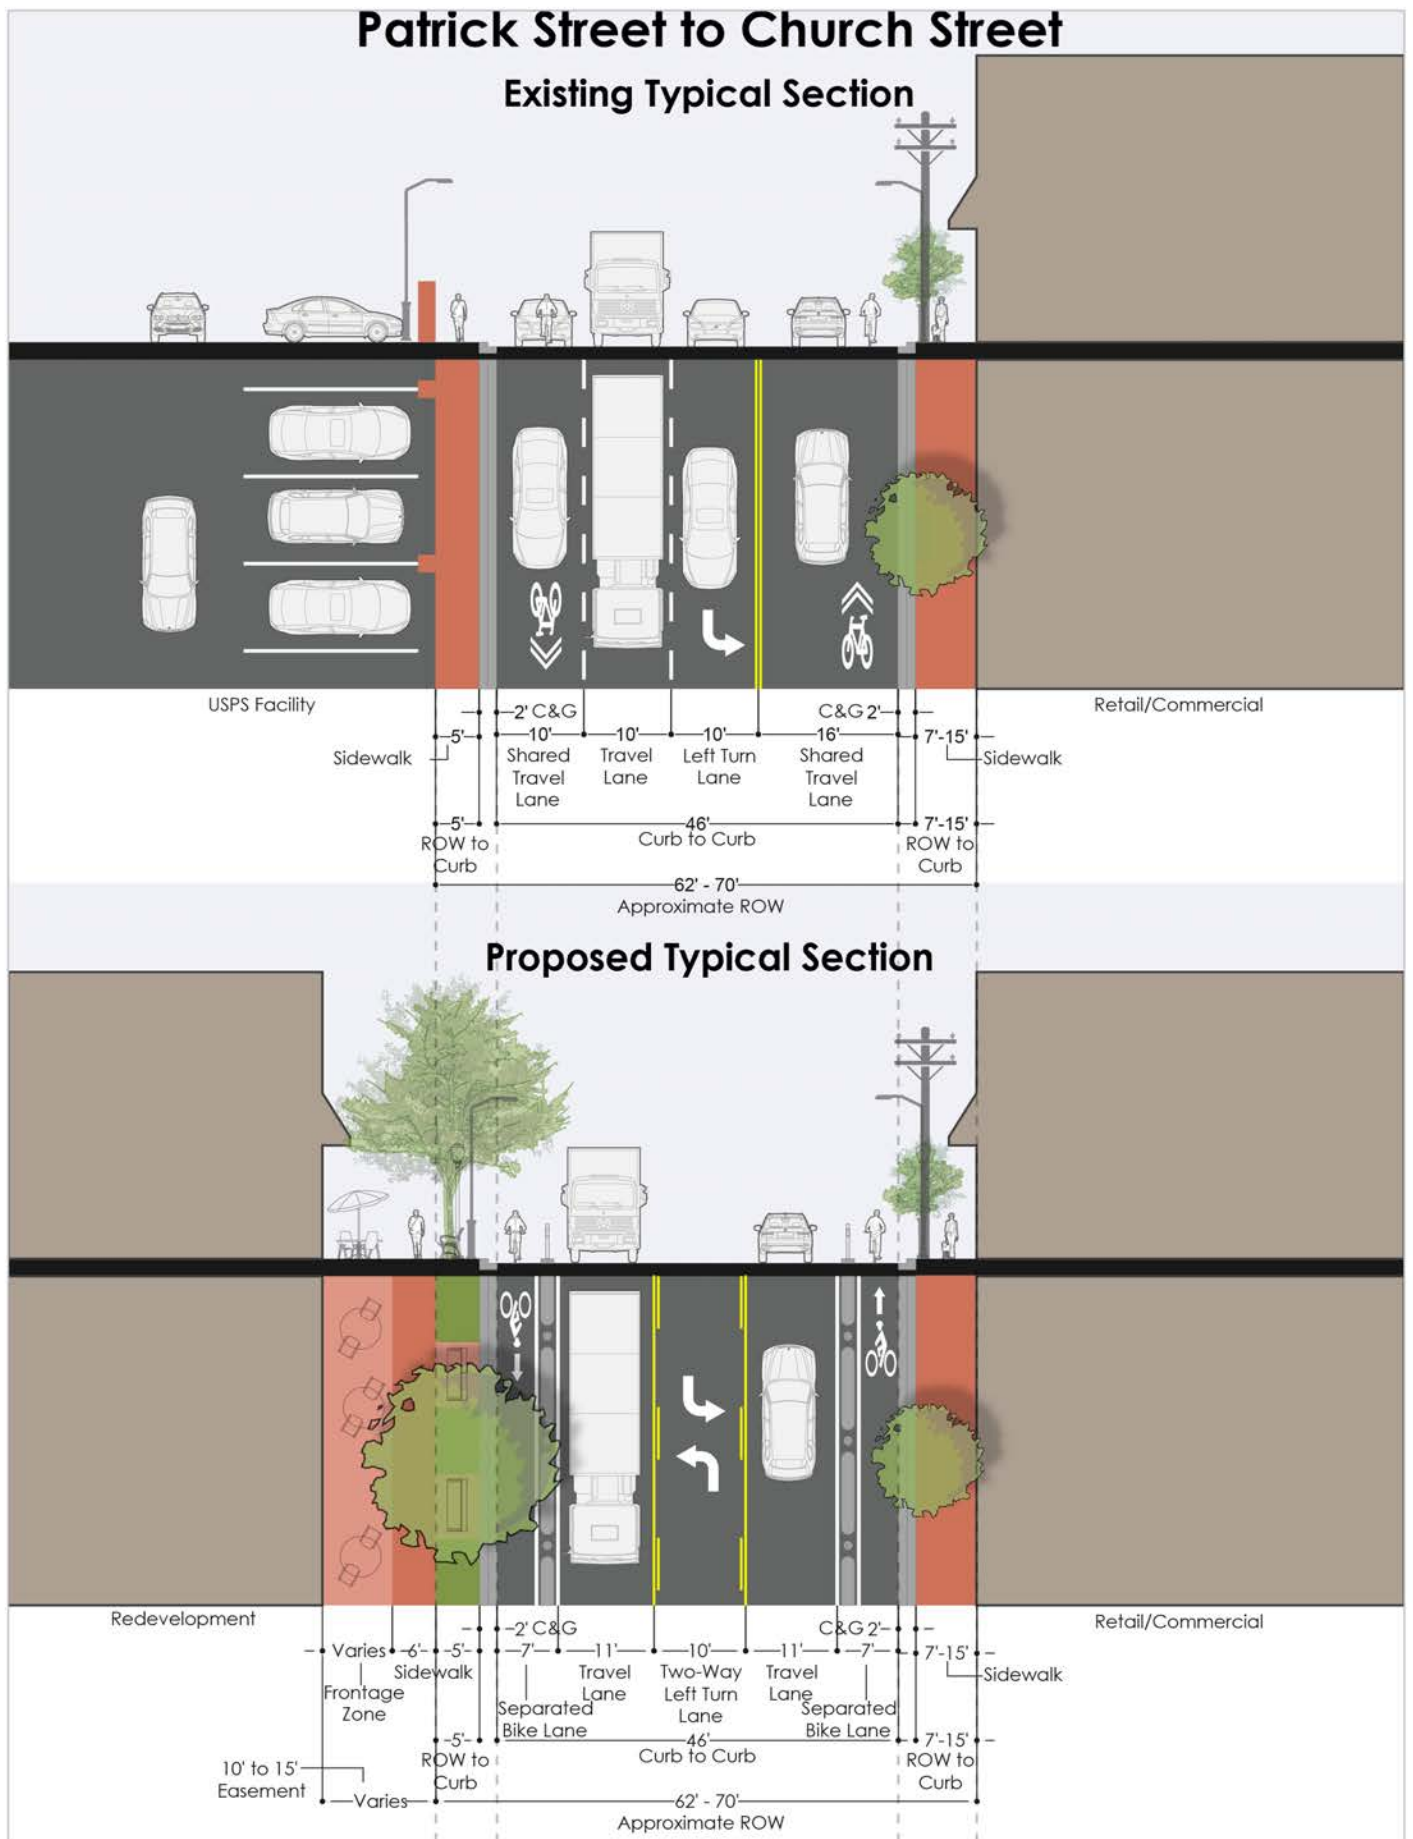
Existing and Proposed Typical Section - Patrick Street to Church Street
